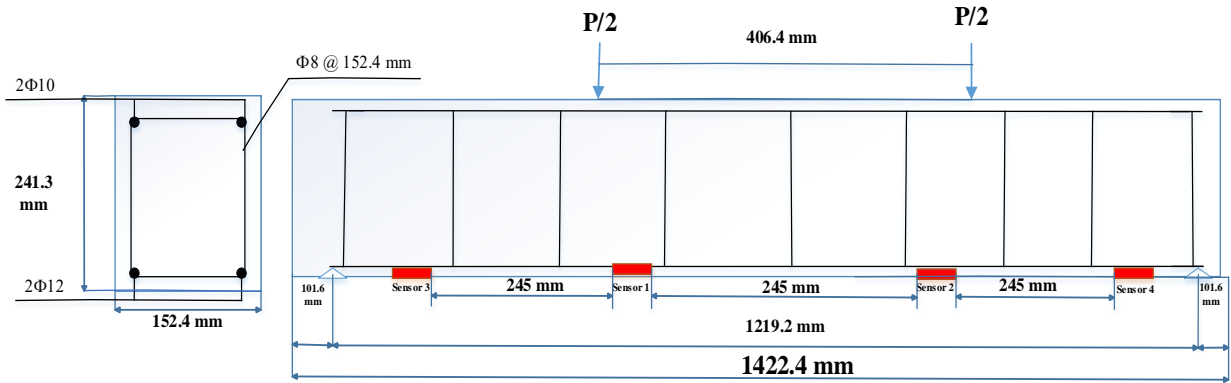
The Schematic of the Reinforced Beam Details and Sensor Layout
